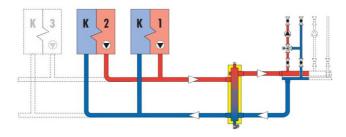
Possible connection DN32 Hydraulic separator vertical
